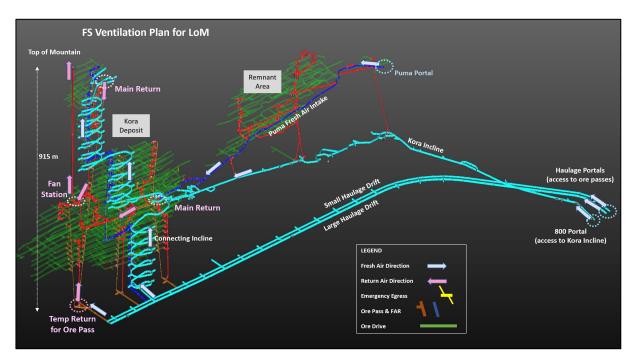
LOM Ventilation Plan Profile Facing Northwest
